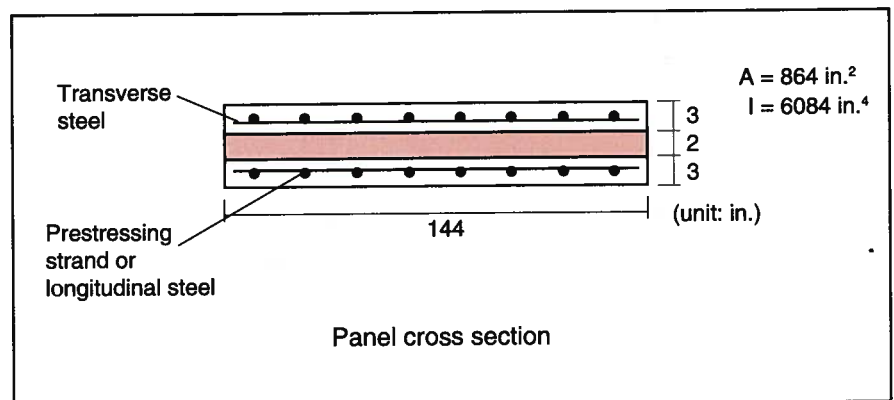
Design of 3-2-3 precast concrete sandwich wall panel. Note: 1 in. = 25.4 mm.
